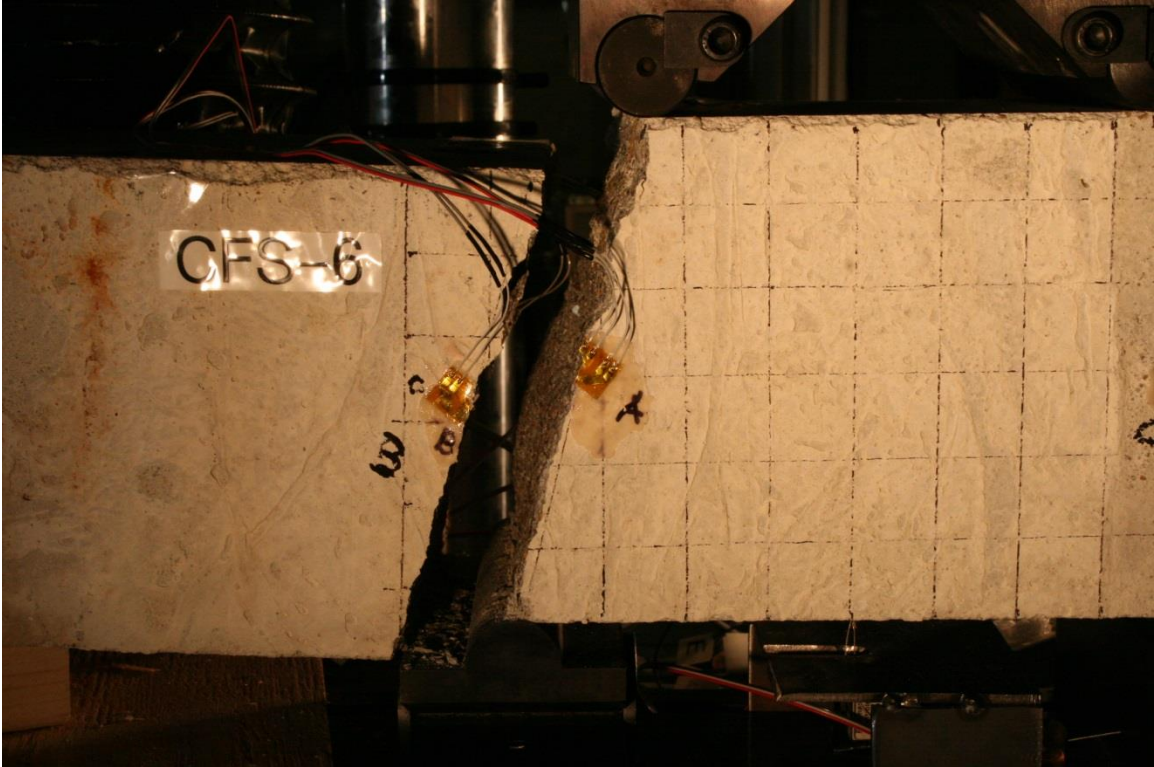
Additional Post-Test Damage, Test No. CFS-6 [9-in. (229-mm) Span]
